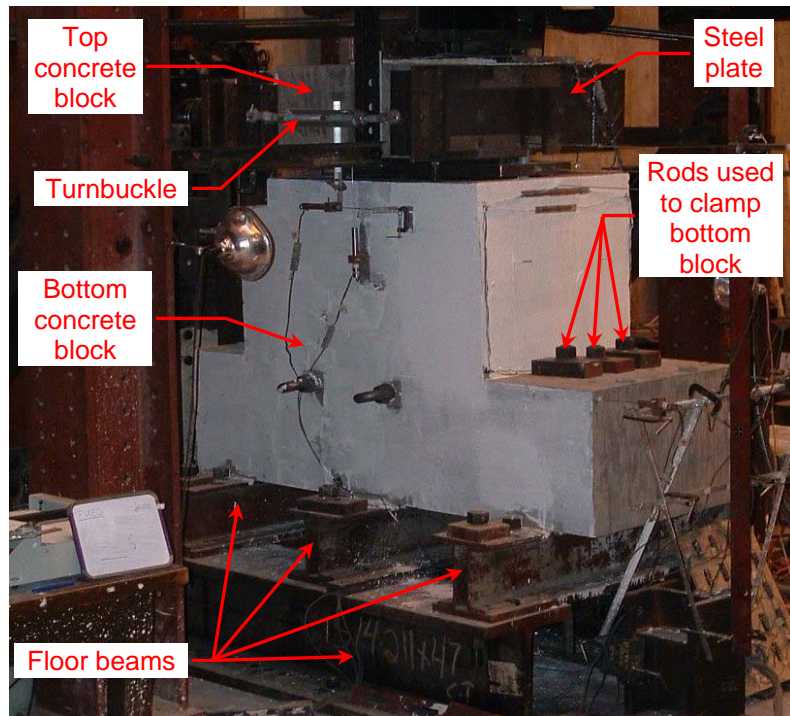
External instrumentation used on fixed-end specimen (LVDTs on back face not shown).
